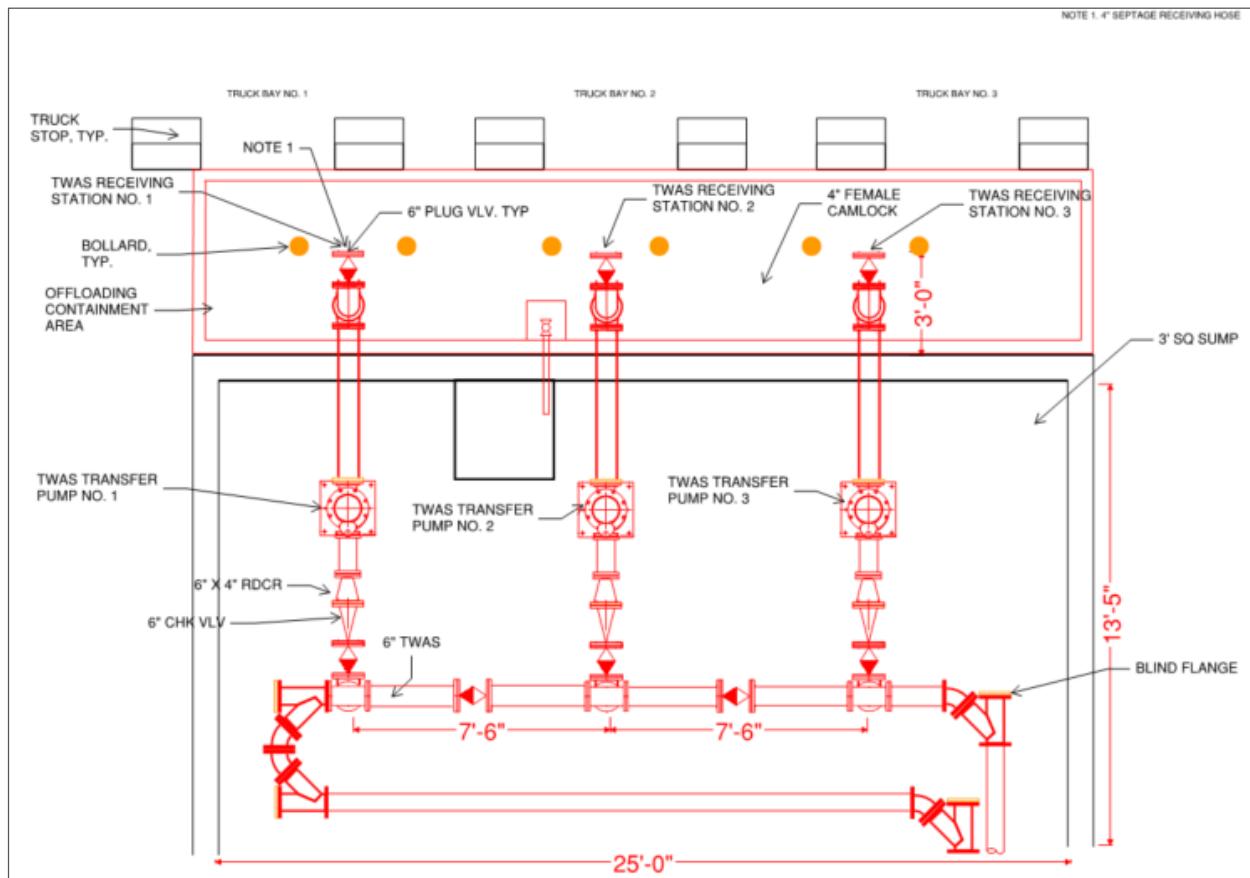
TWAS Structure with Pumps Outside Building 12 (ALT 3)
